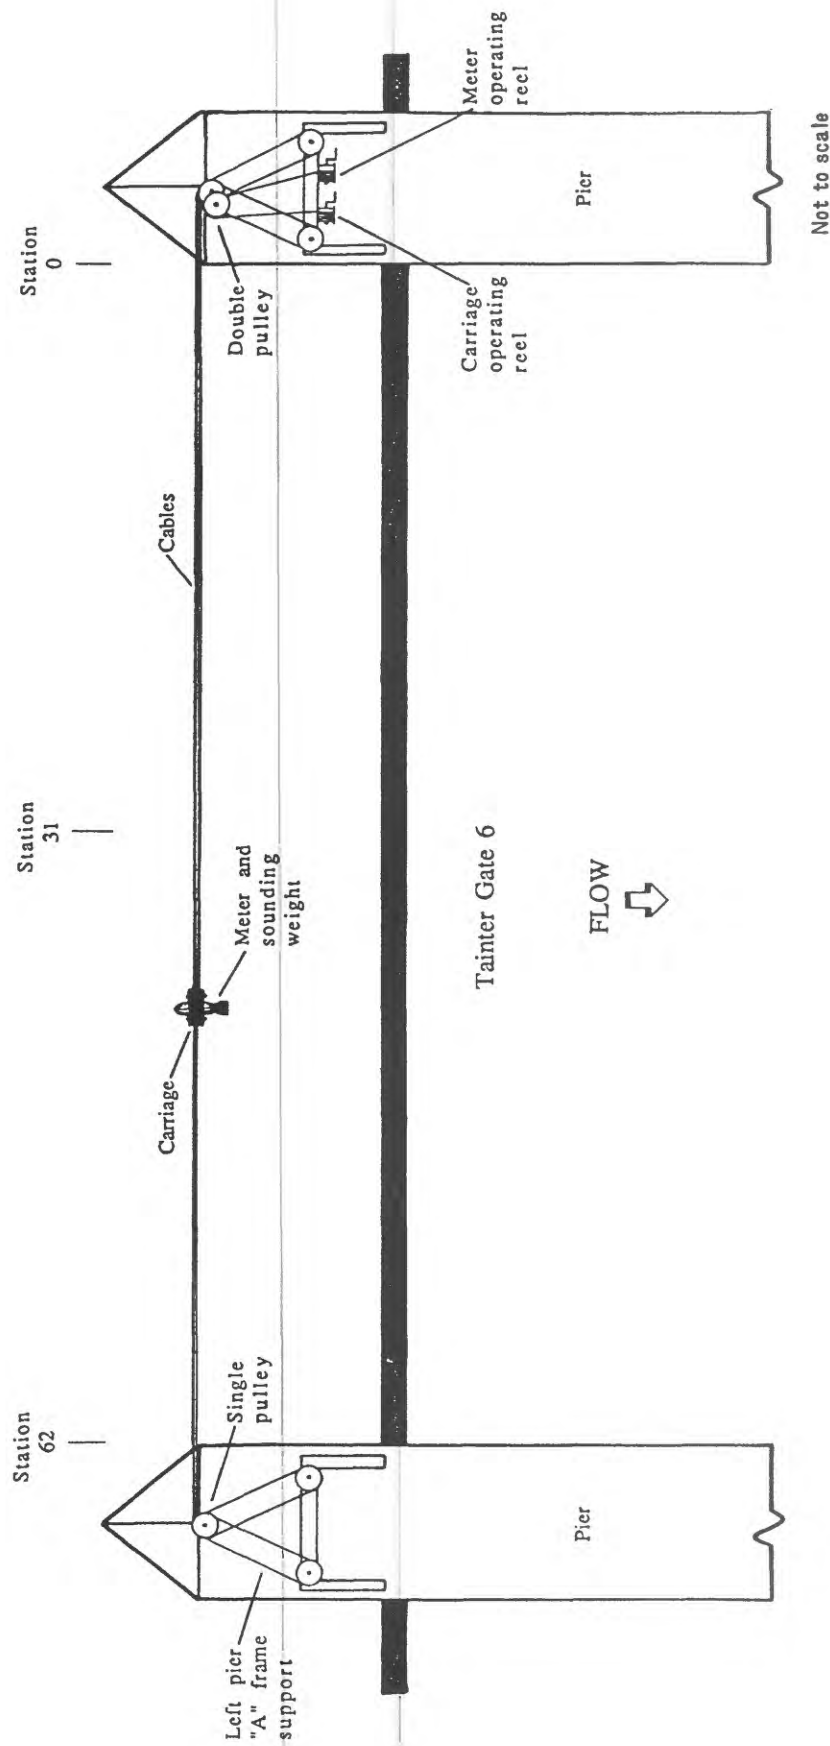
Overhead view of carrier cableway used to make forebay discharge measurements at Dresden Island Dam.
